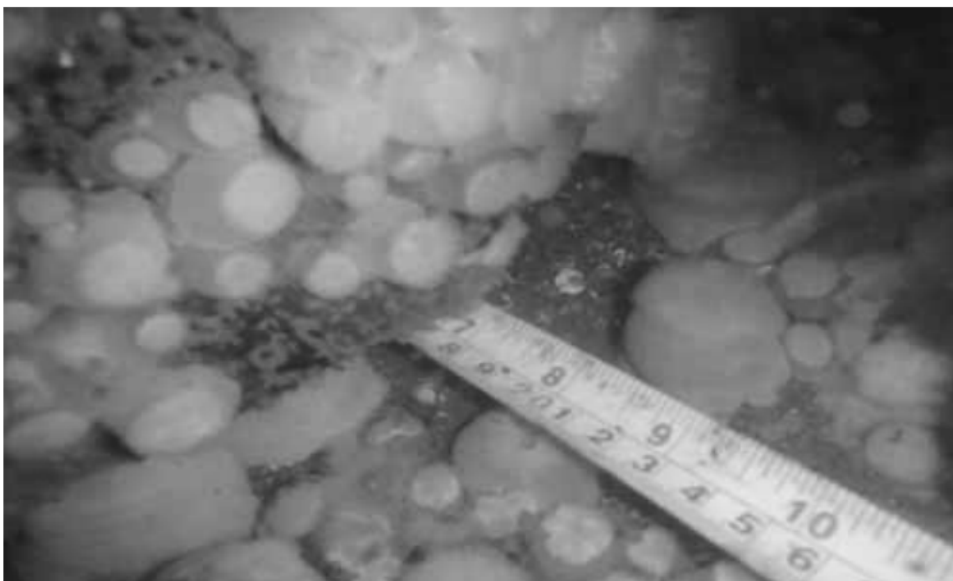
Canal Bridge No. 6880 - Pile No. 7.1 on Pier No. 8 in partial bearing.
